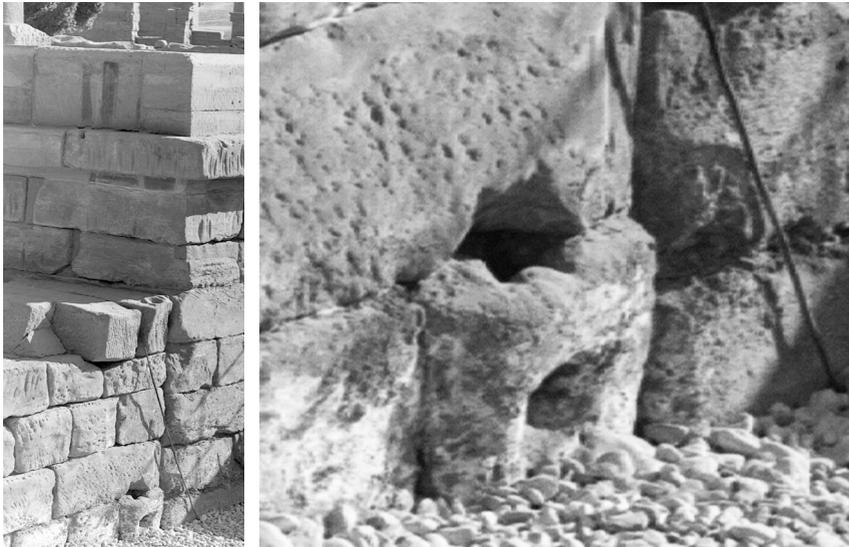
(left). North quay wall at Karnak showing the steps and two mooring loops (after CHEVRIER, 1947, pl. 48); Figure 7 (right). North-west corner of the western tribune with a mooring stone in the fifth course of the north wall (after 39685 ©CFEETK).
